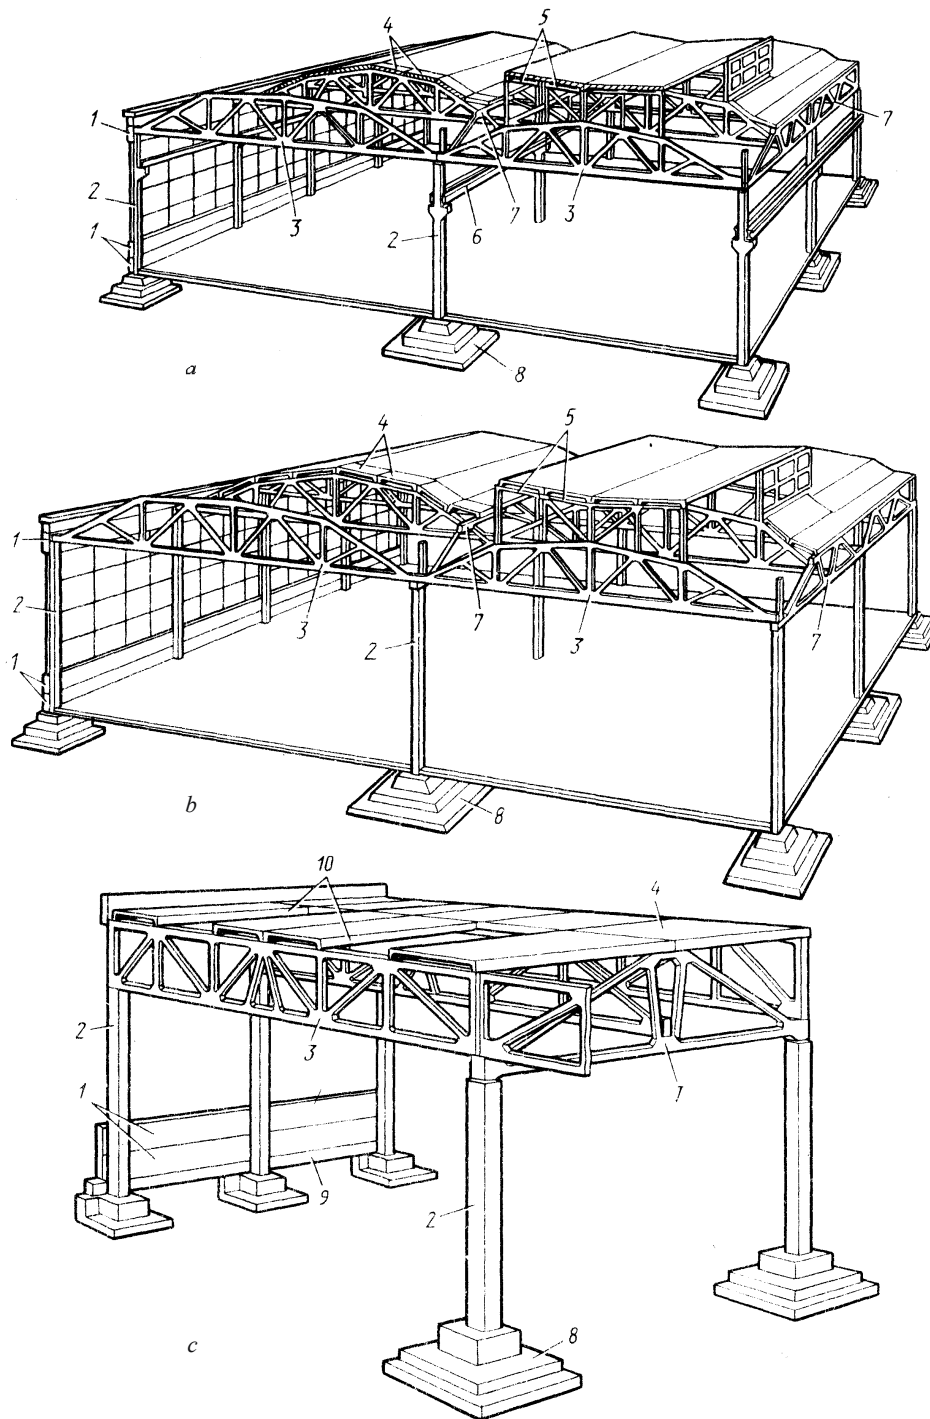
Span structural schemes of one-storied industrial buildings [1]:
